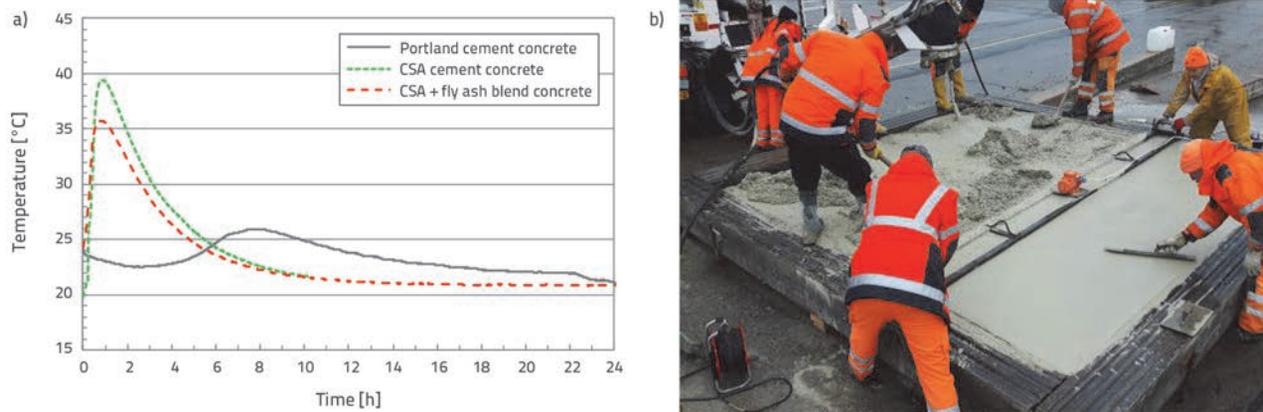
a) Comparison of temperature development of Portland cement concrete, CSA cement concrete and CSA and fly ash blend concrete during 24 hours [37]; b) Placement of CSA cement based concrete on airport runway (photo courtesy: T. Conjar, TPA)
